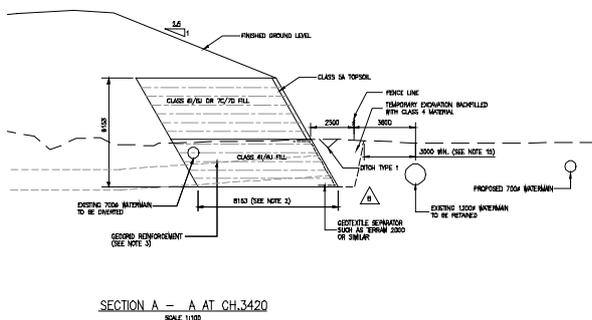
S64 Knights Place Reinforced Slope with Water Main at Toe
